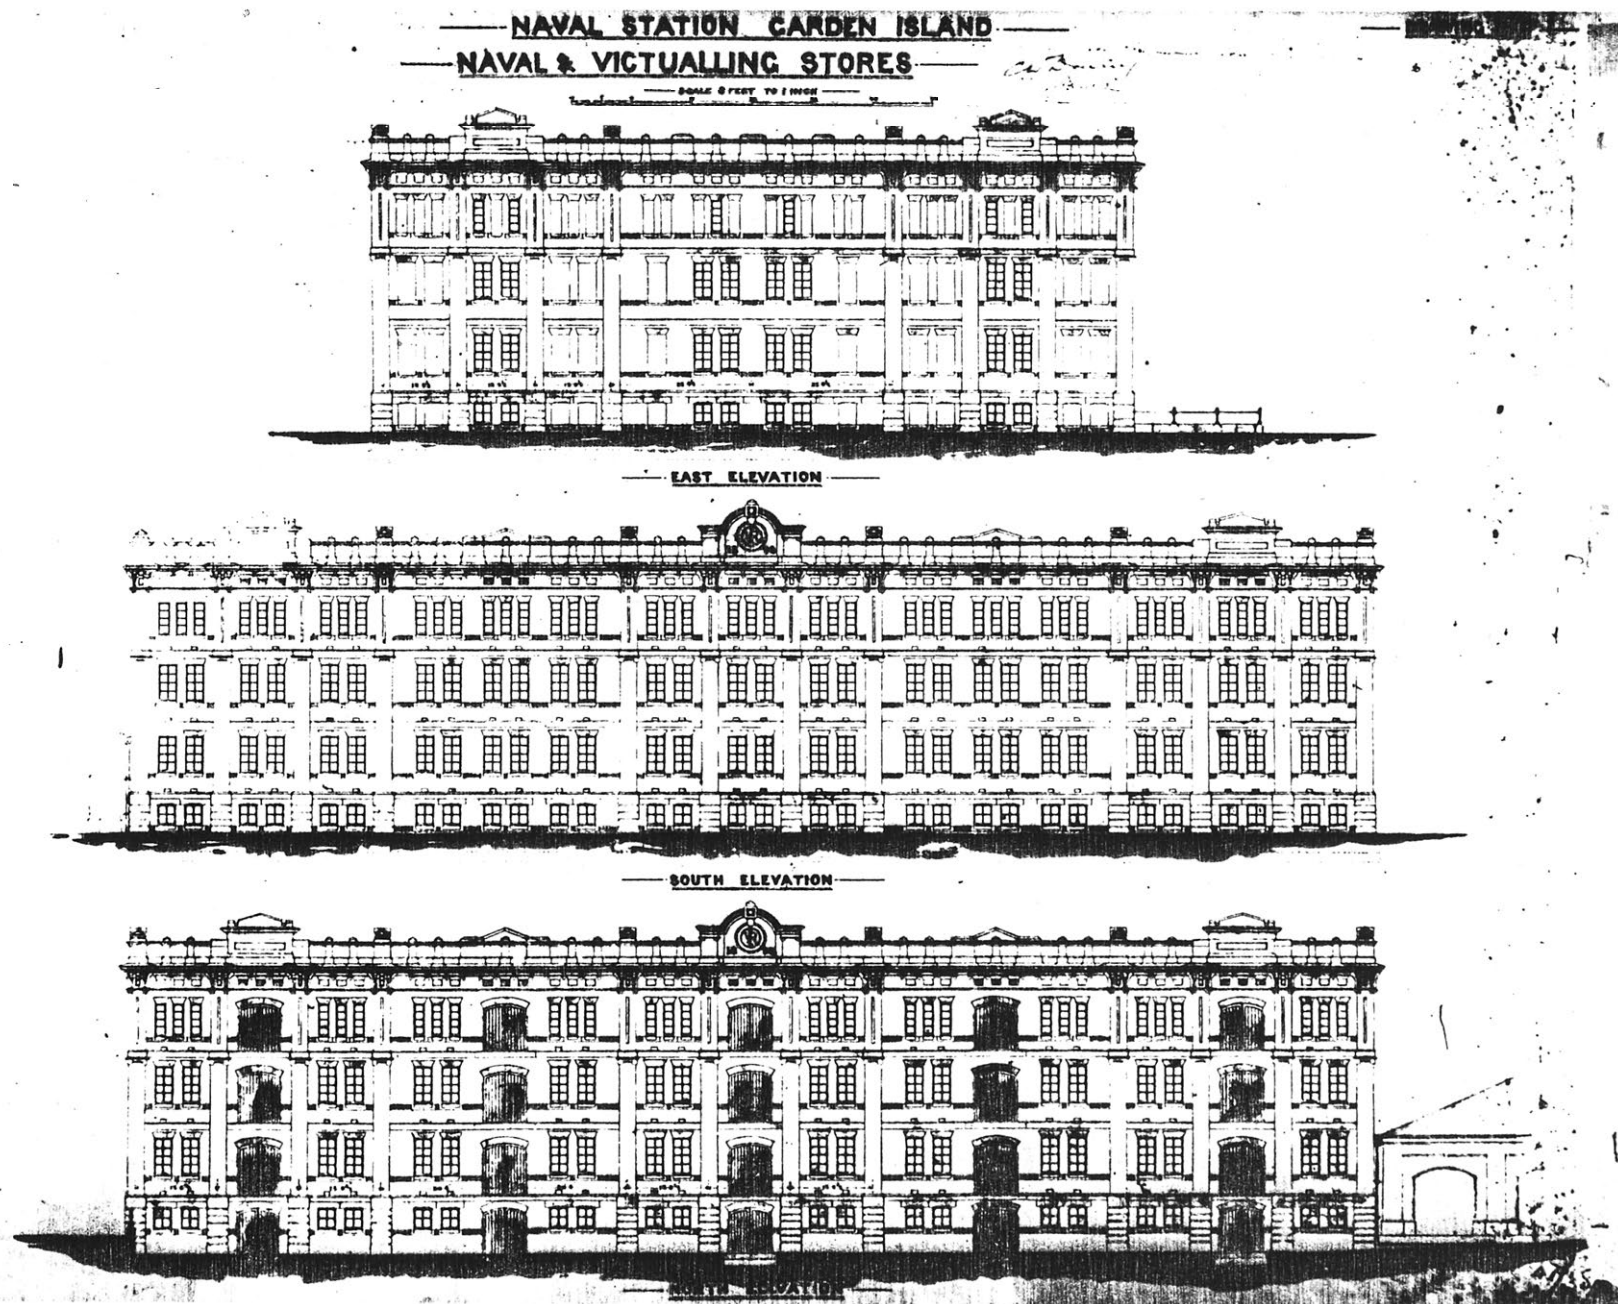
Naval and Victualling Store (Building 89) - Elevations, 1892
